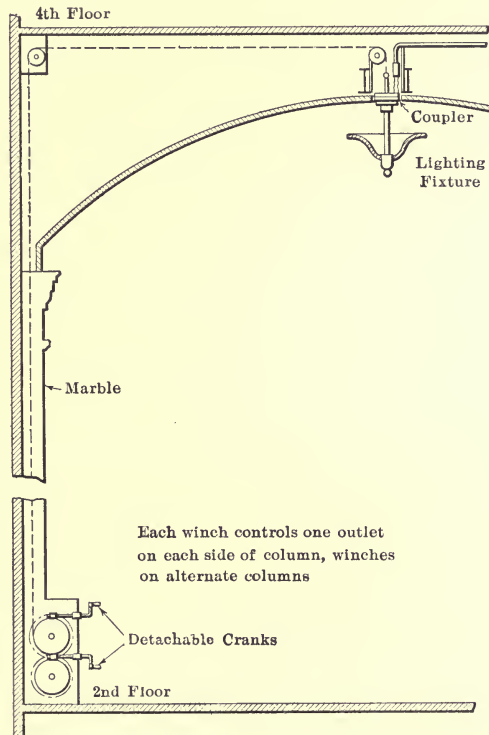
LIGHTING FIXTURES IN A BANK.
